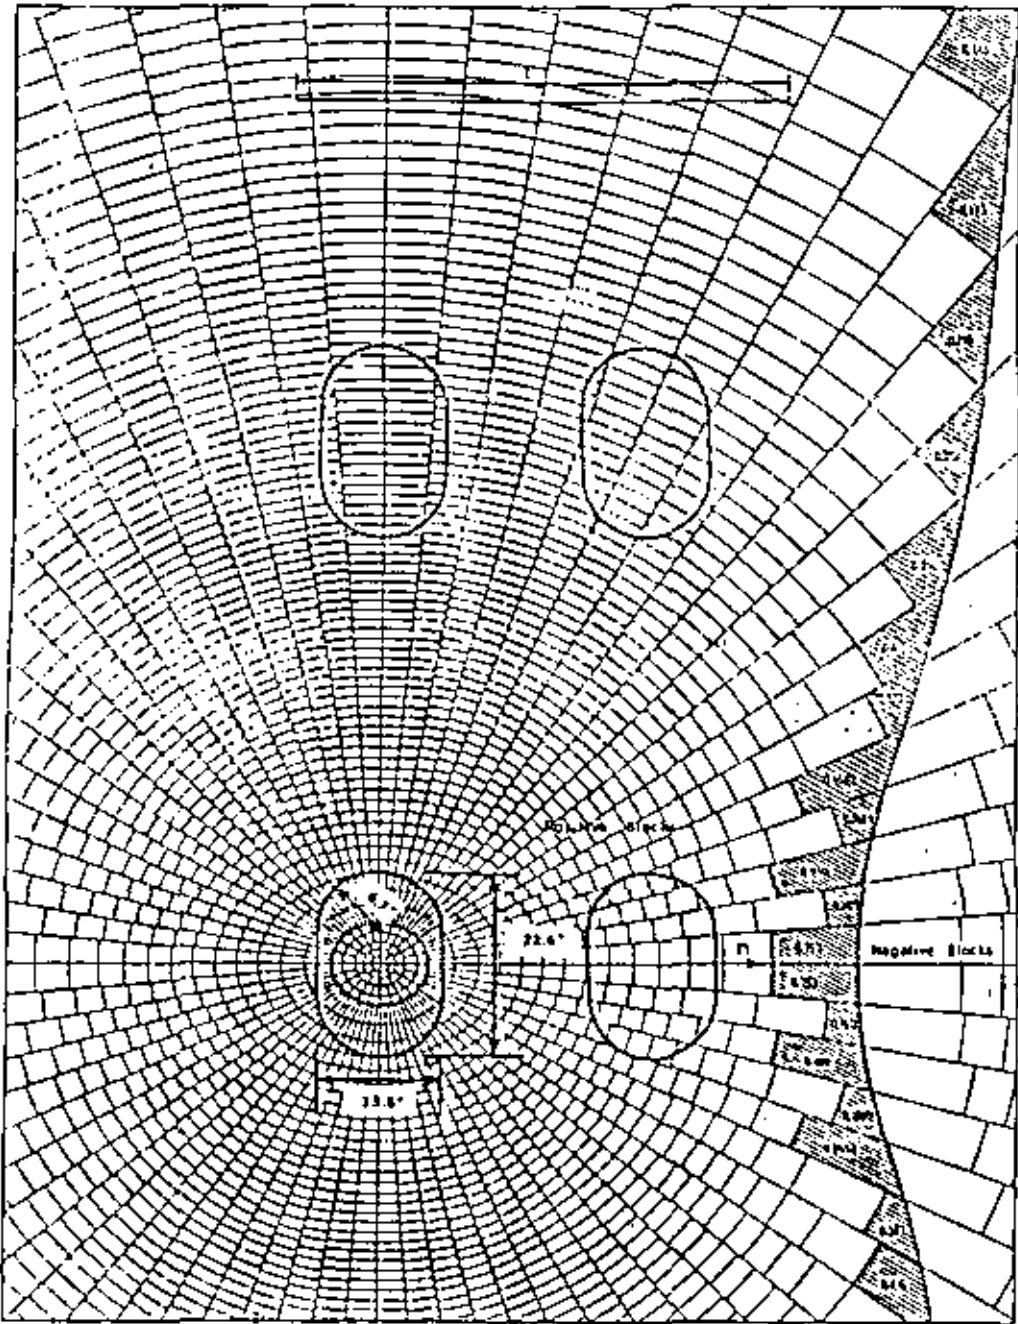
Influence chart for the moment M_x in a concrete pavement due to a load in the interior of the slab. (Subgrade assumed to be a dense liquid, Poisson's ratio for pavement assumed to be 0.15.)
